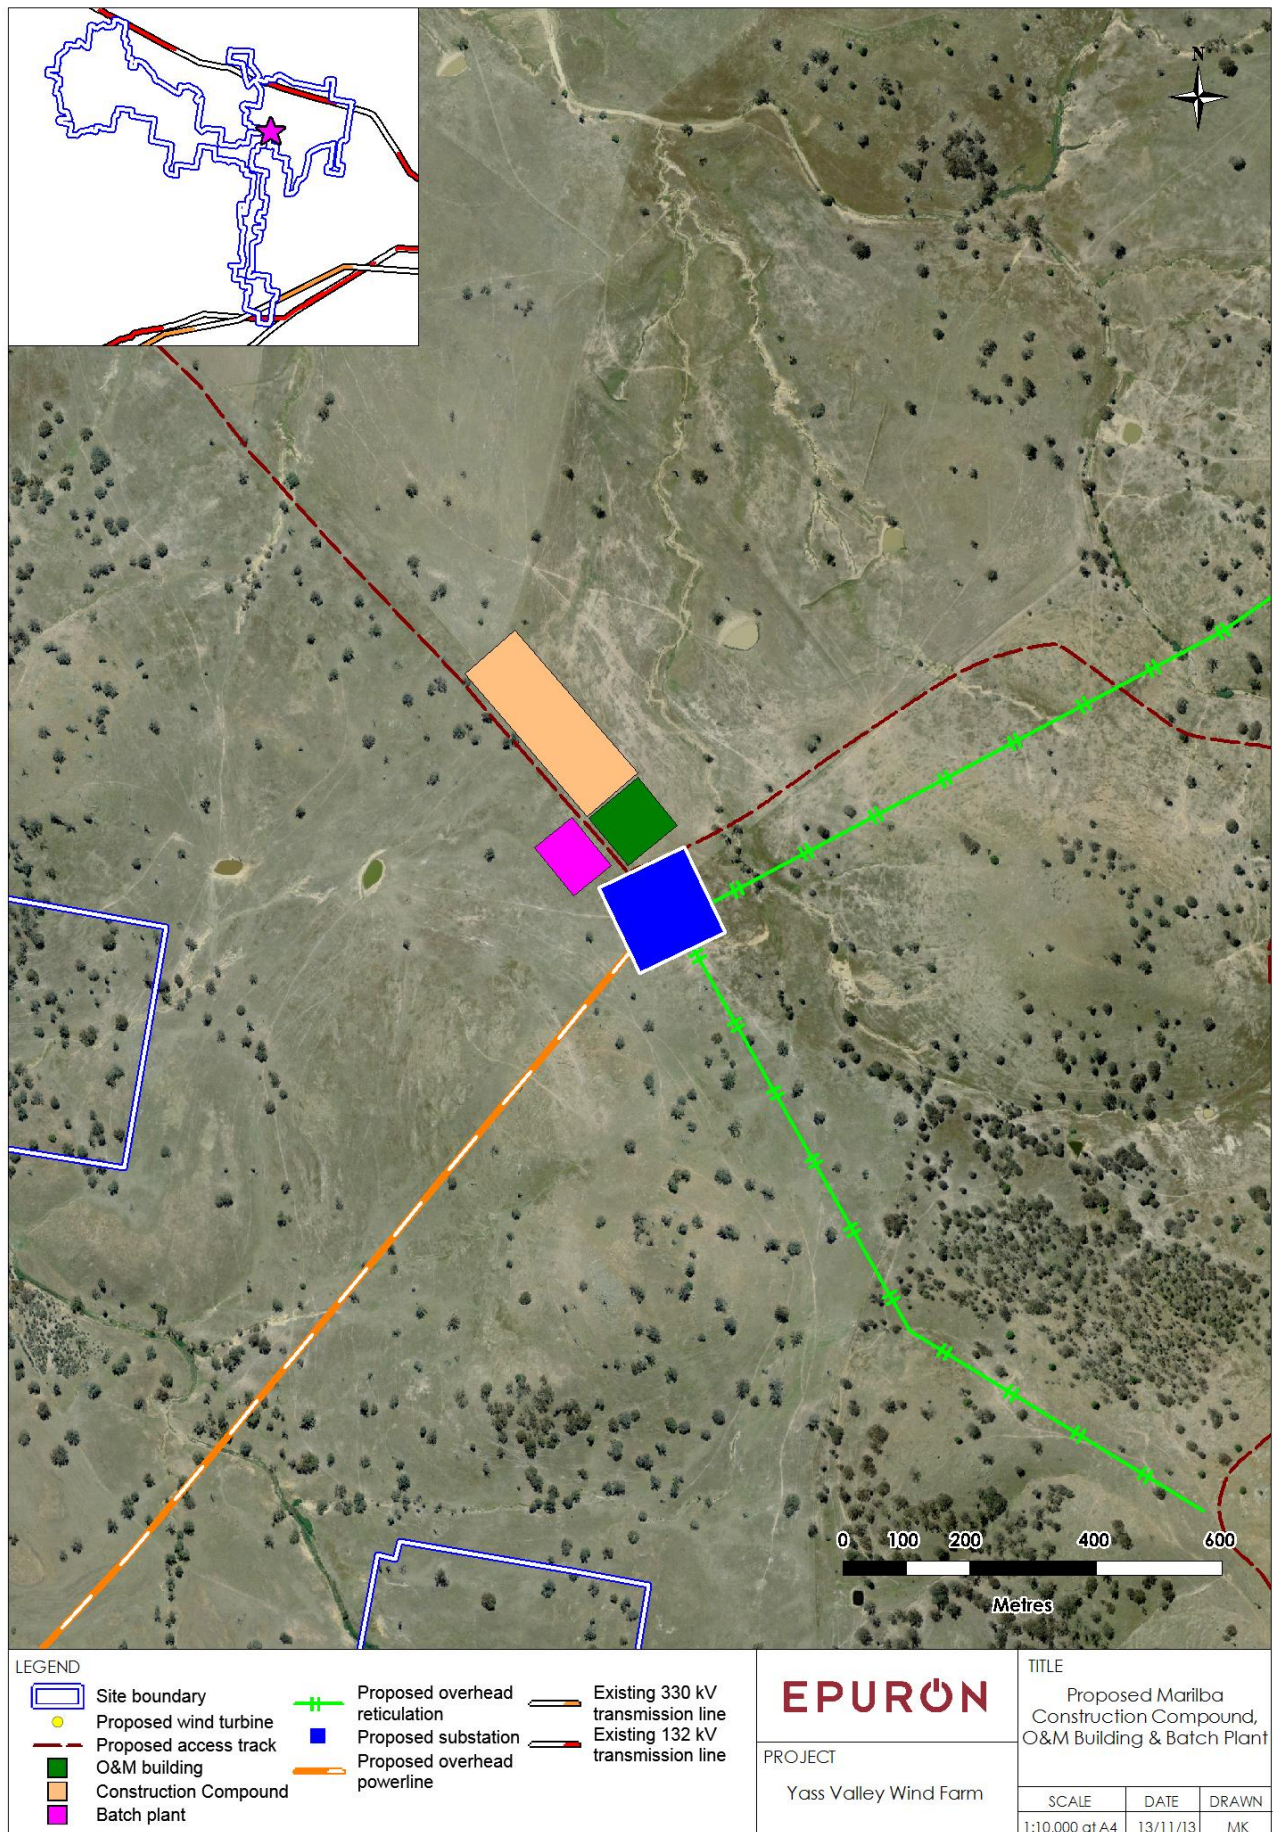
Marilba collection substation, construction compound, O&M building and batch plant
